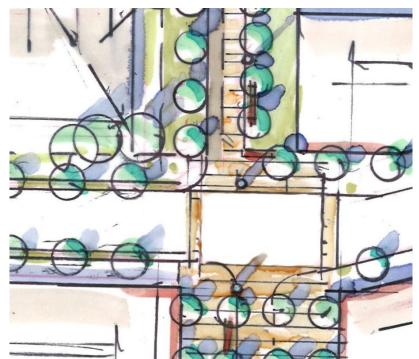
Plan View of Intersection at UWalk North and Duke Avenue
